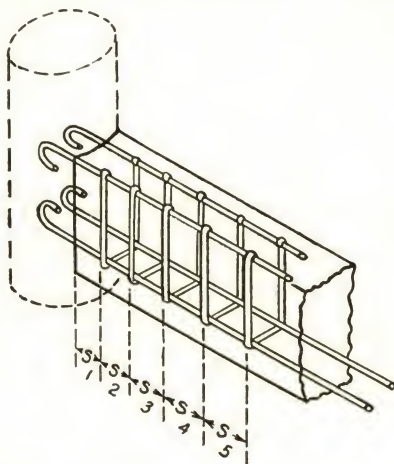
B. Typical Reinforced Concrete Beam, with Anchored Longitudinal Bars and Vertical Stirrups
